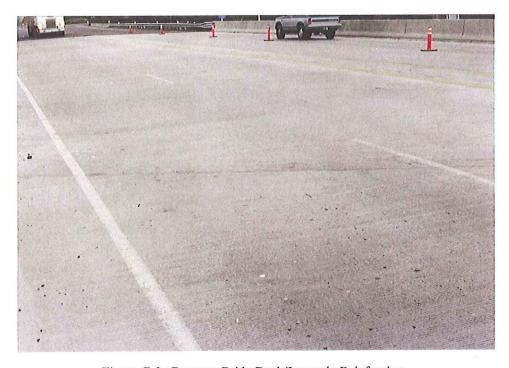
Concrete Bride Deck/Isotropic Reinforcing
